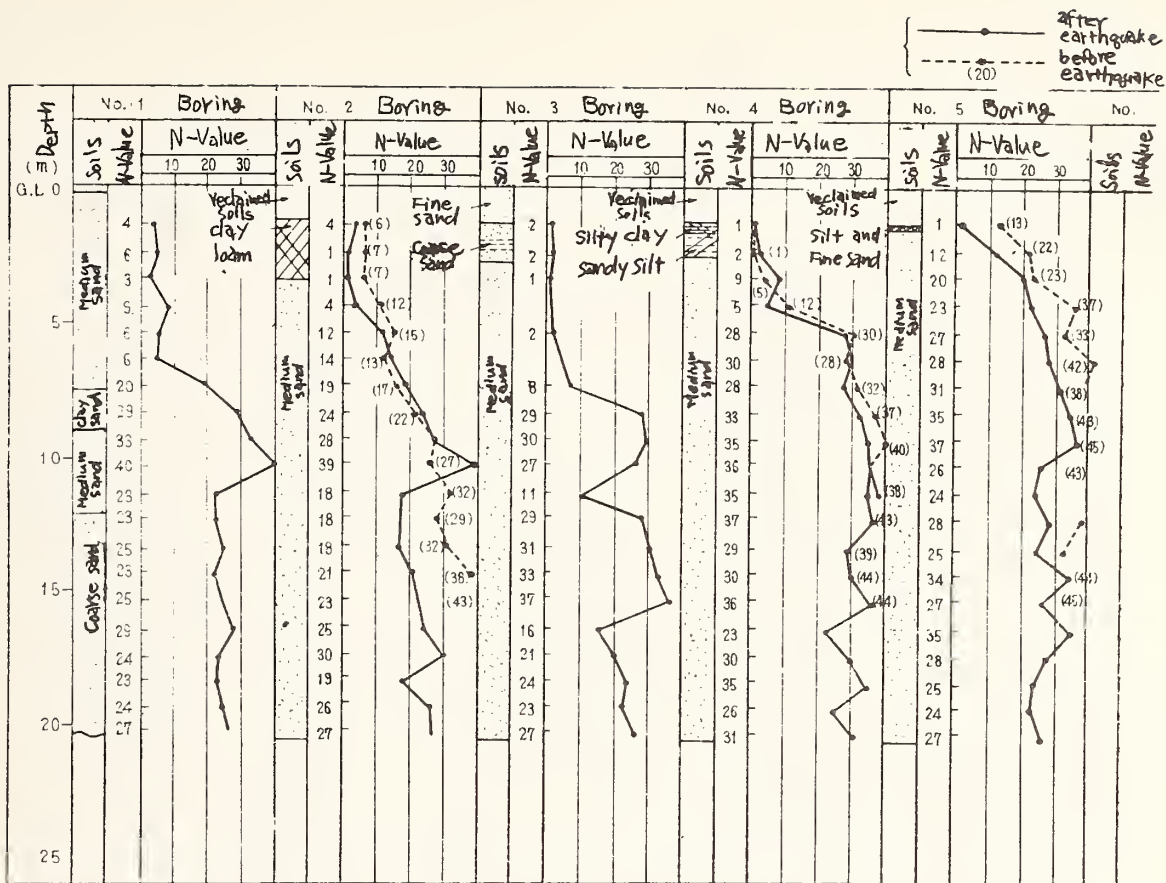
Boring logs at the Higashi-Kosenkyo bridge
